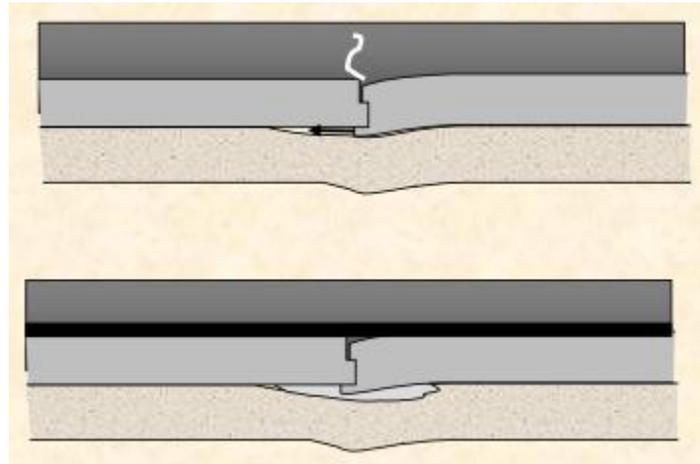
Composite pavement without (top) and with (bottom) fabric interlayer to arrest reflective cracking (From Al-Qadi et al. 2009)
